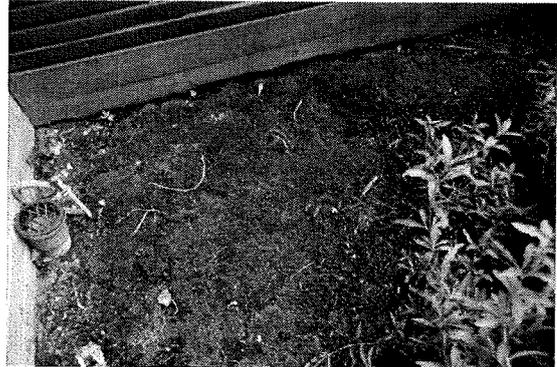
Garden bed at the west of the western stairwell - saturated.
